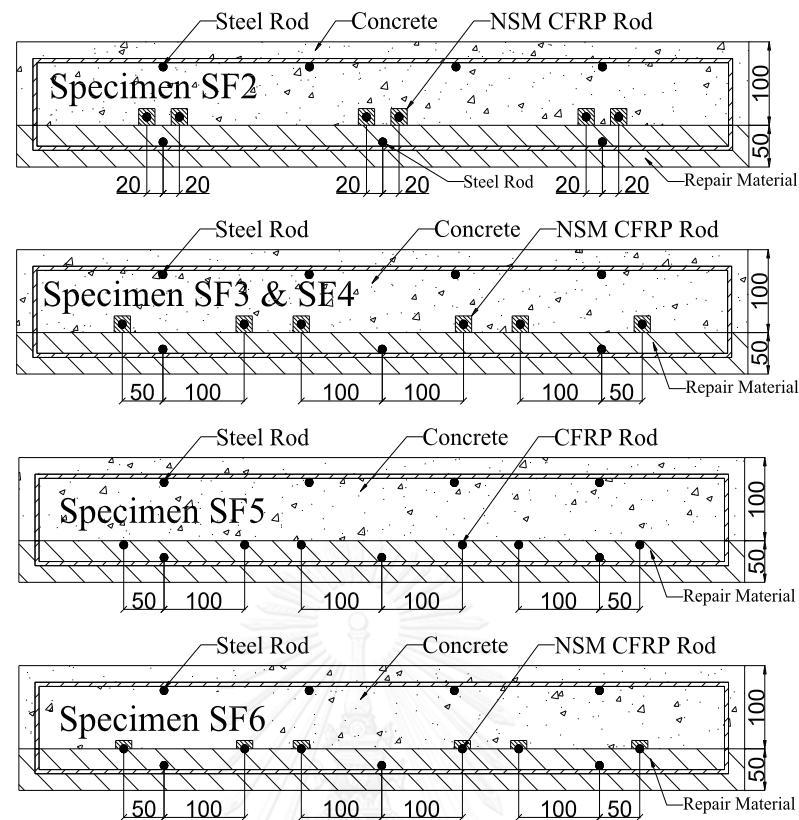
The design of fire-damaged reinforced concrete slabs strengthening with NSM CFRP rods.
